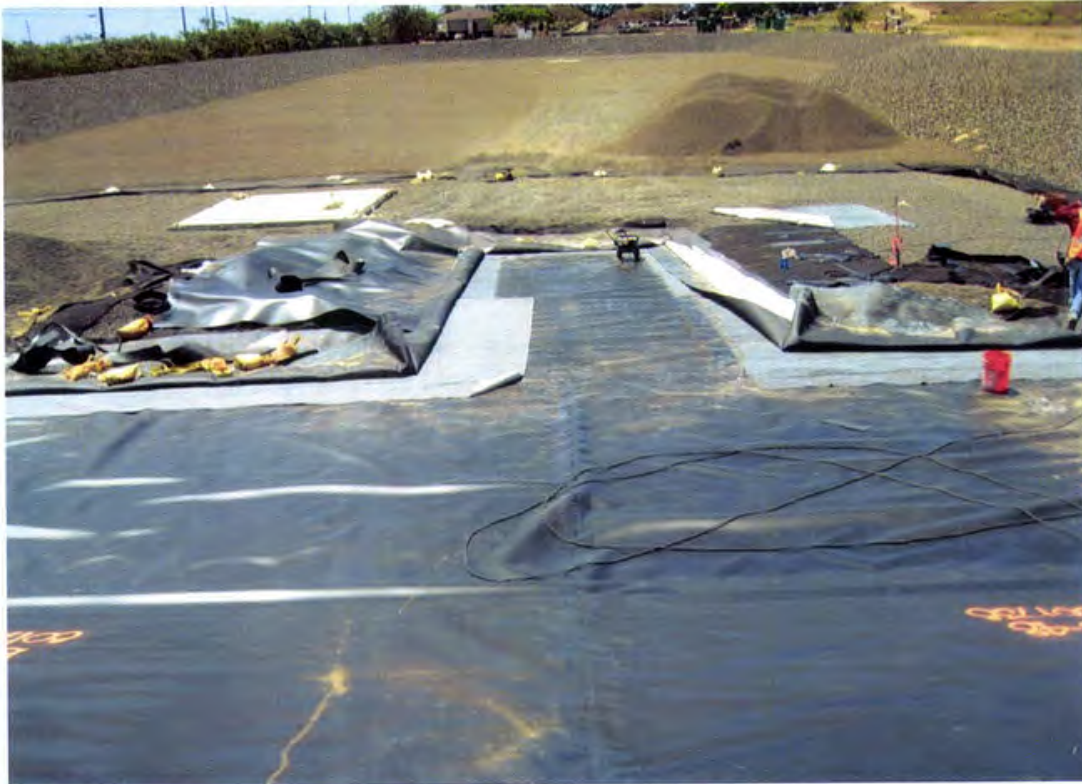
Subbase 60 mil HDPE geomembrane installed in the west berm area (looking east)
